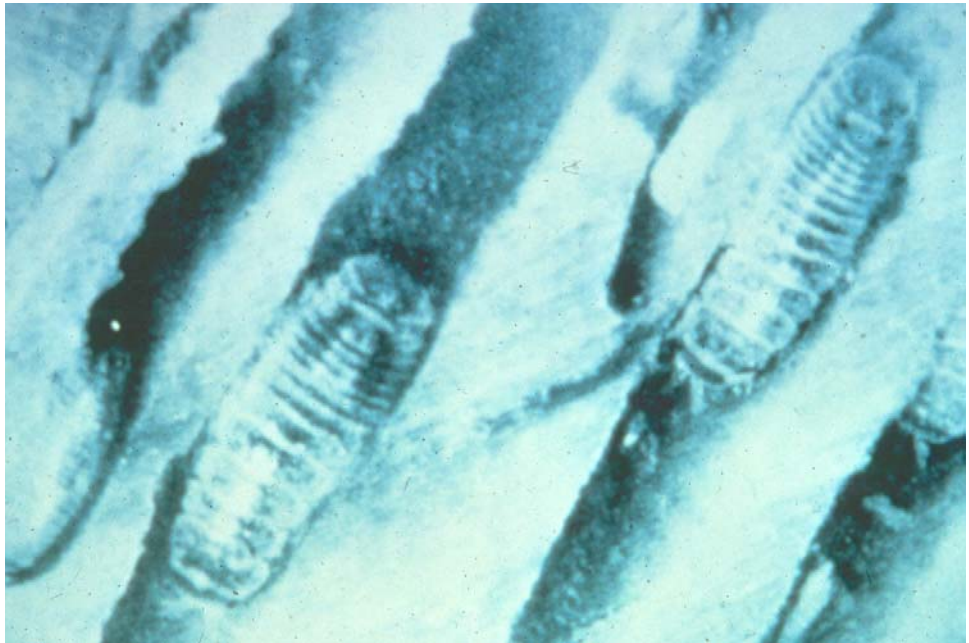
Marine Borer Damage to Wood Piling
